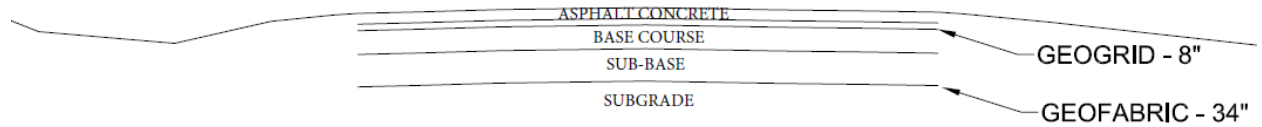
The as-built cross section of the test section FWD4-6. Horizontal scale is equal to vertical scale.
